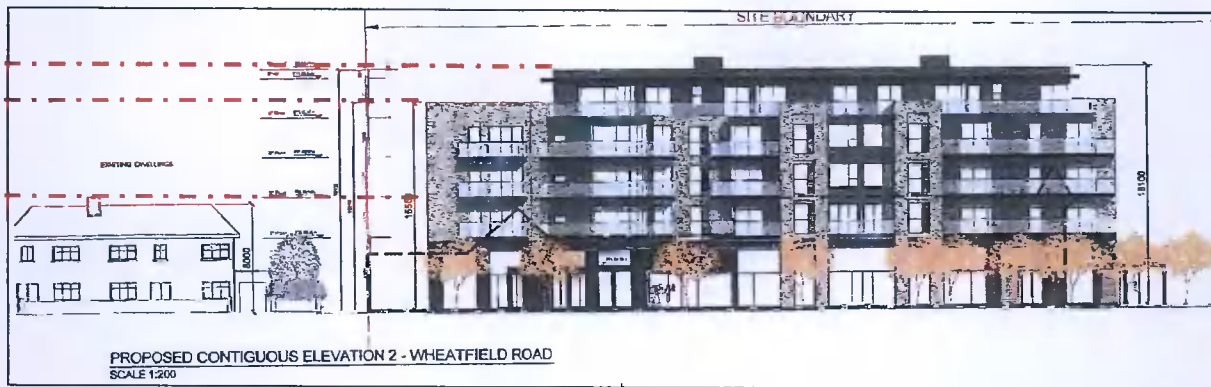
Contextual elevation of the proposed development as it interfaces with Wheatfield Road.
